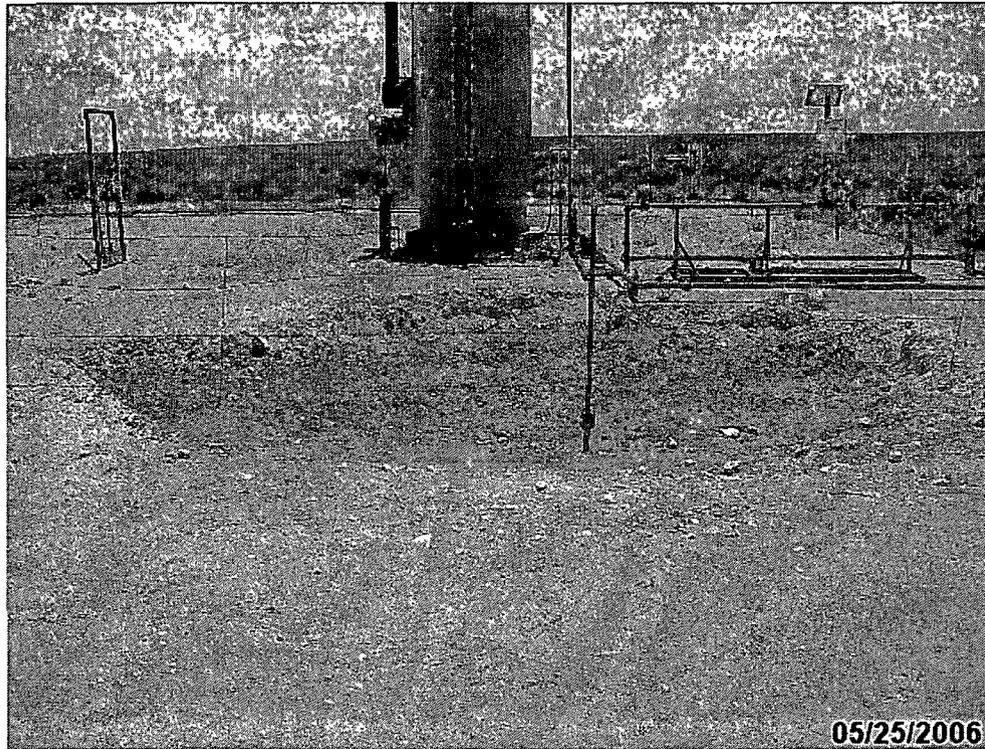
Looking southwesterly across excavation area two (2).
